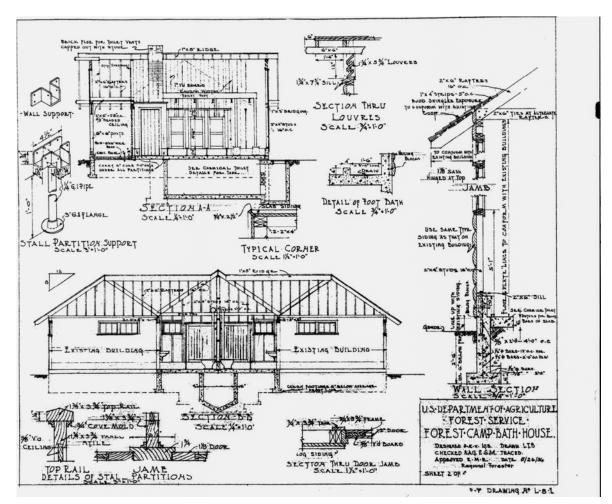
1936 bathhouse plans showing center section to be added to the building. From HABS PA 5963, online, <u>http://www.loc.gov/pictures/item/pa2802.photos.357206p/</u>, accessed April 1, 2015.
